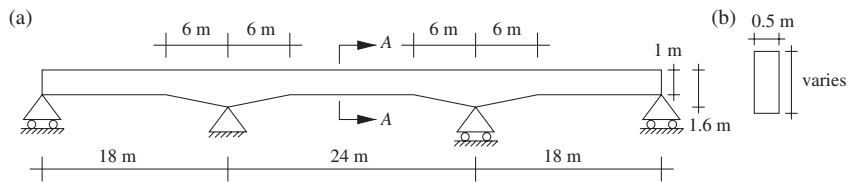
A three-span continuous non-uniform beam: (a) elevation; (b) section A–A.
